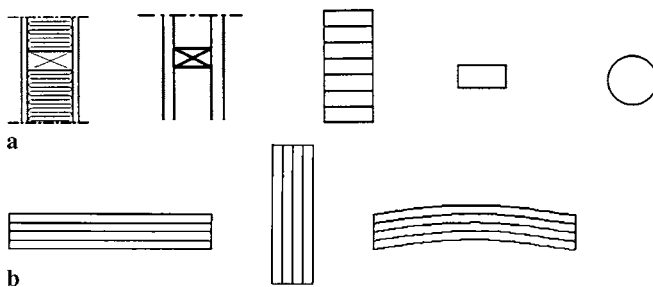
,b Examples of end uses a structural timber as studs (cross-sectional view), beam and free standing elements, b glued laminated timber as beams and columns
